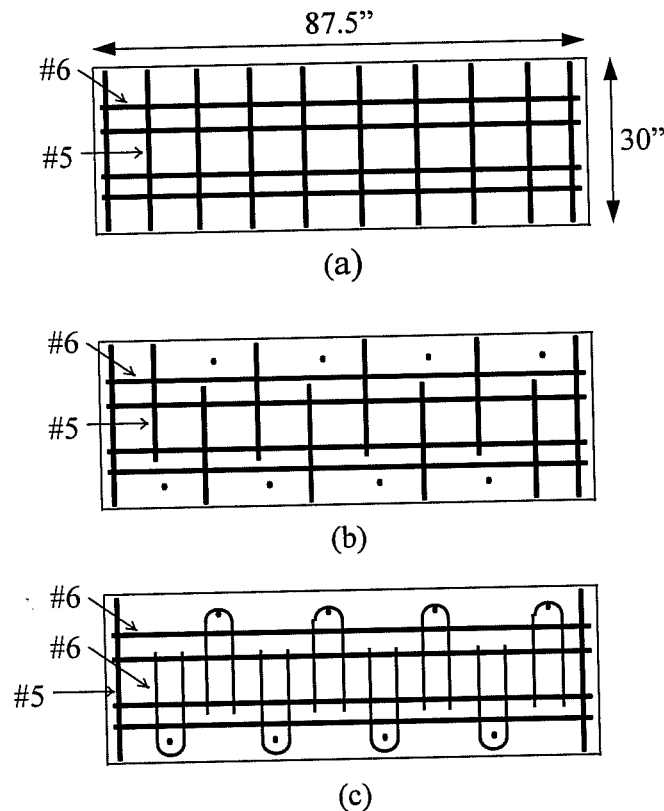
Reinforcement for Shear Tests: (a) bottom reinforcement in blocks for shear tests (b) top reinforcement when no hairpins are used (c) top reinforcement when hairpins are used
